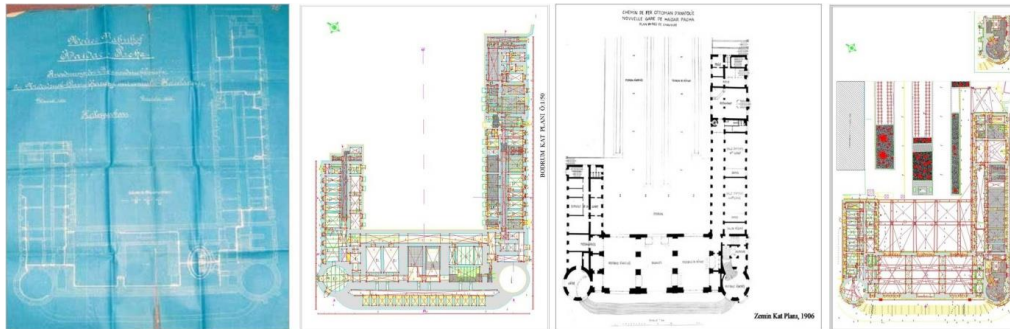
Building surveying plan dated 2014 prepared by Ritter and Cuno (Left) B. Floor (-3.30)
